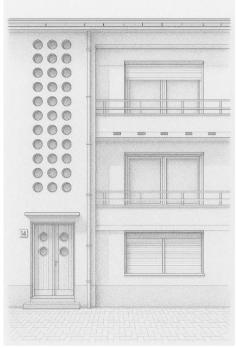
Part of north façade of residential building - facing the Borka Taleski street (Source: author)
